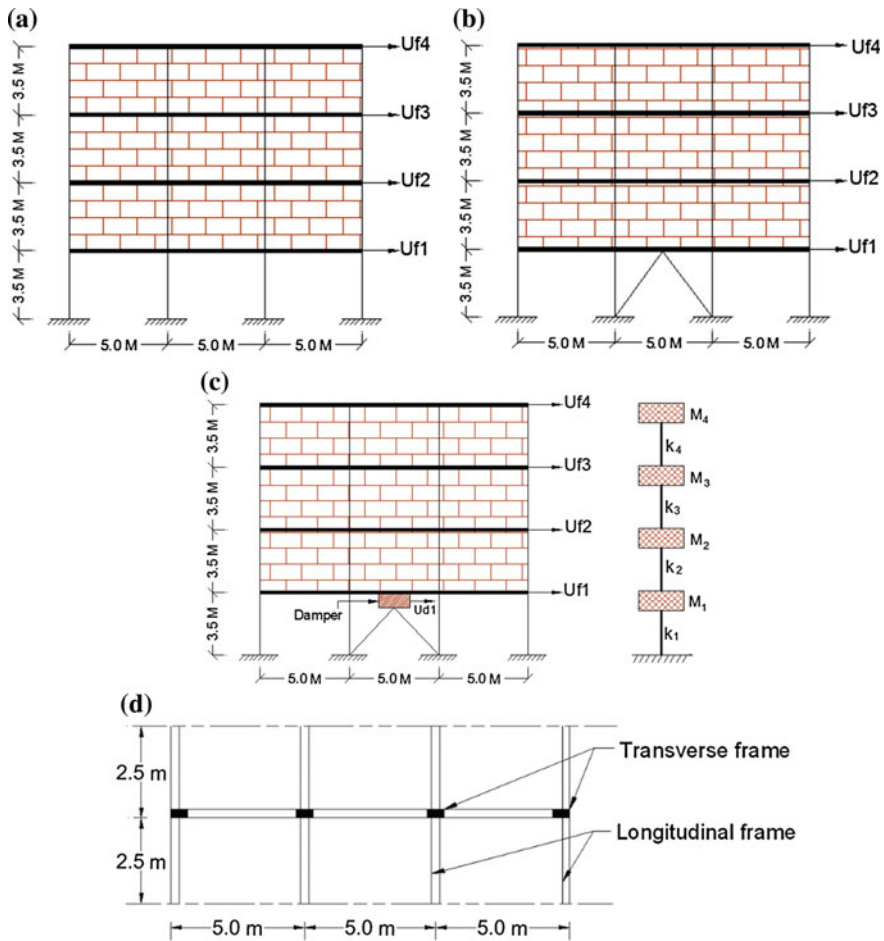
Schematic diagram of example soft storey frame building with supplemental damping system. a Soft storey free frame. b Soft storey braced frame. c Soft storey frame with friction damper d Plan showing columns and beams at floor level for the example soft storey frame building
